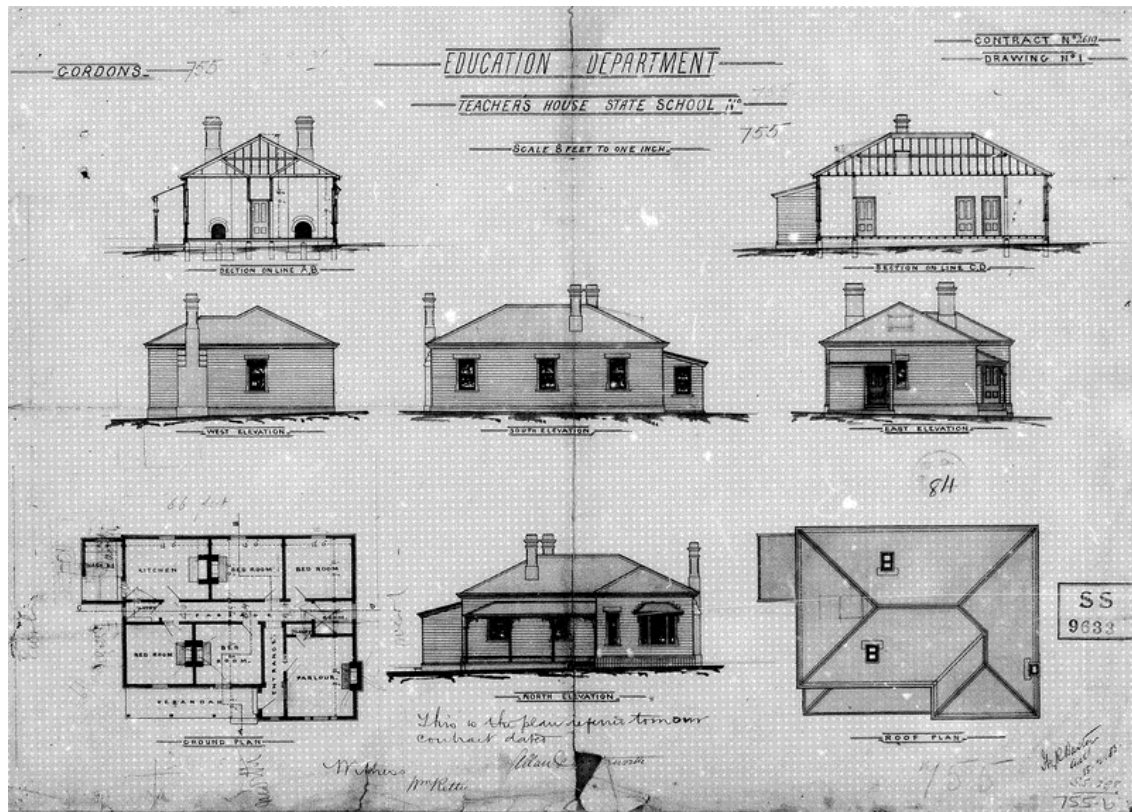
H.R. Bastow, Proposed Teacher's Residence, Gordons State School, floor & roof plans, elevations & sections, 1883. Source: Public Works Department (Building Services Agency) Plan SS755 PROV.
